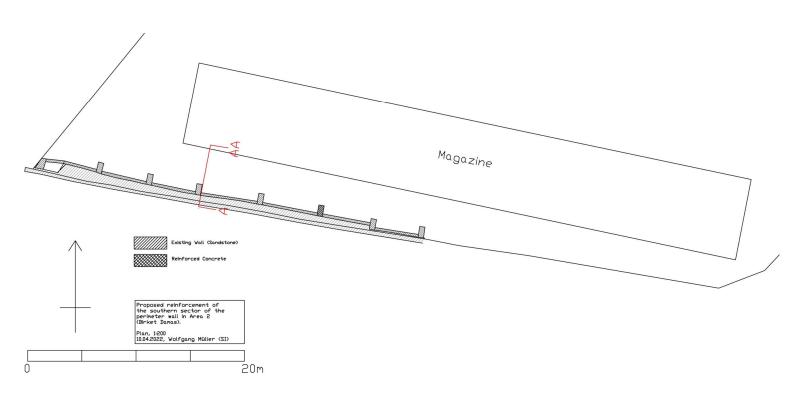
Area 2: Plan of the reinforcement of the southern perimeter wall.
